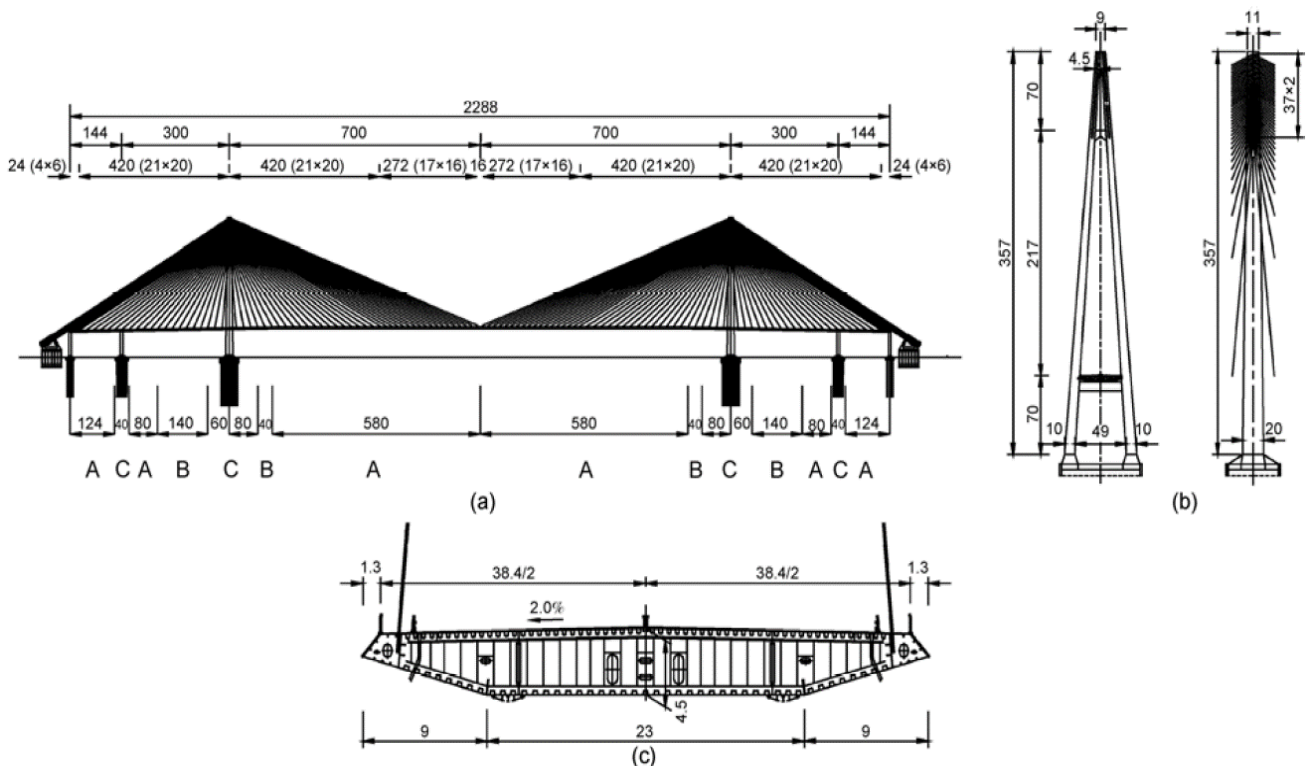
Geometric configuration of the bridge examined in Sun et al. (2010):
